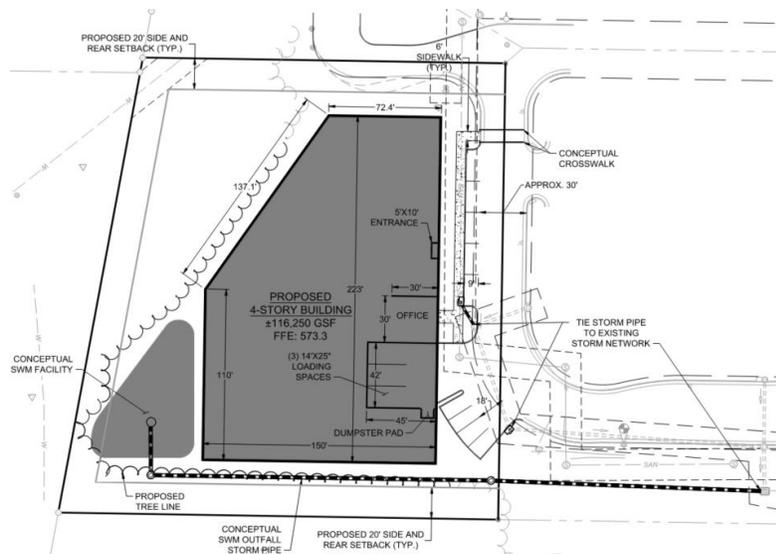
Sheet 5 of Attachment 4: Conceptual Plan – Parham Circle Storage – Layout & Utility Plan
